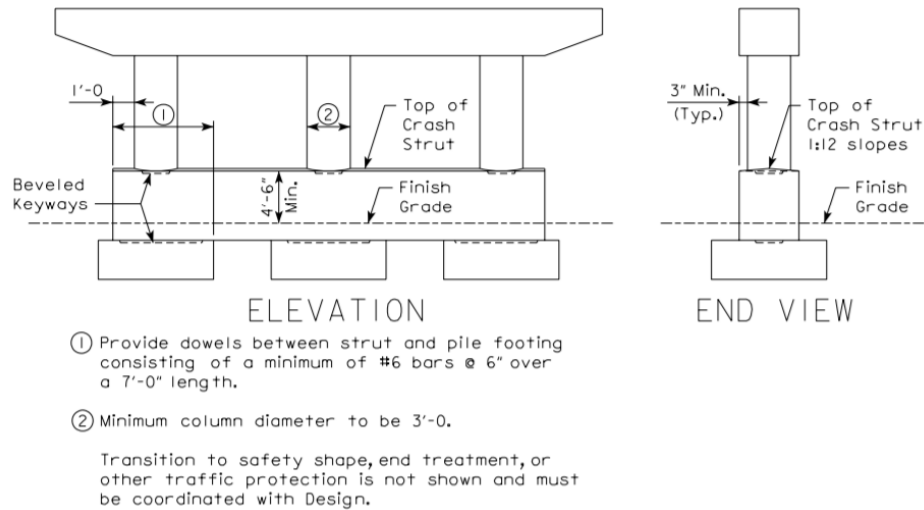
Frame pier with a crash wall requirement in Iowa DOT BDM (2020)
